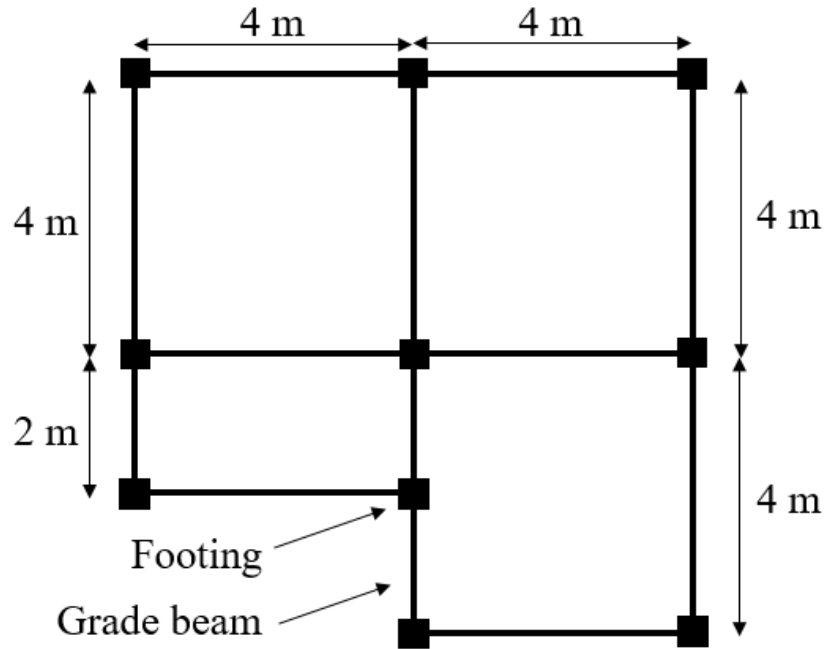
Layout of footing and beam foundation for case study three-room home
